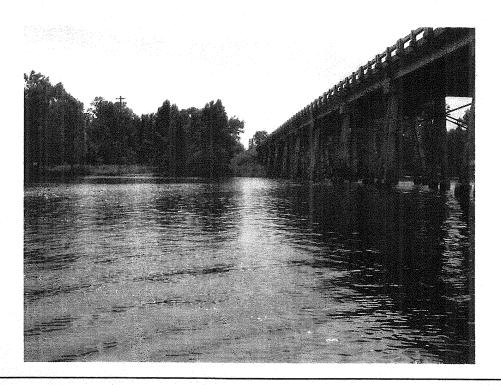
This photograph was taken from the existing bridge, left of the -L- alignment, looking south, across proposed End Bent No. 2.
